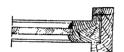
Section of Hall Screen's Frame and Upper Wall Stile.
